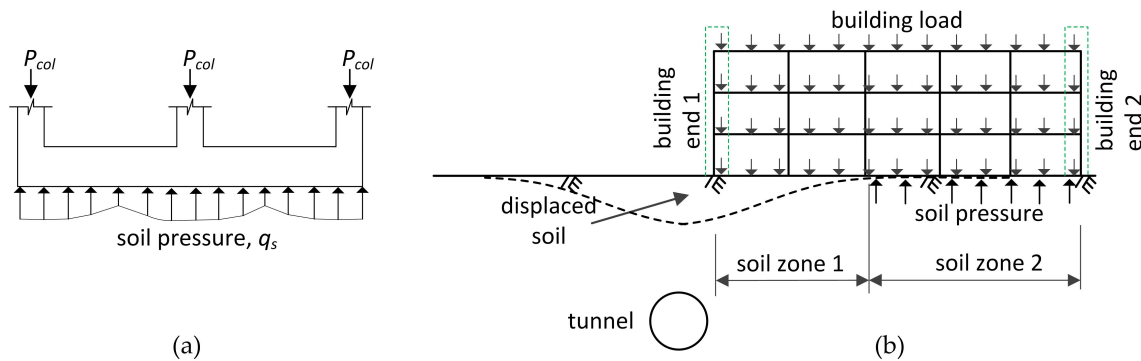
(a) Building load – soil pressure equilibrium on foundations, (b) tunnel–building interaction problem
